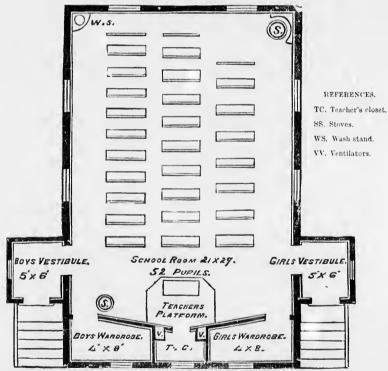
,-GROUND PLAN ADAPTED TO FIGS. 95 AND 97.
